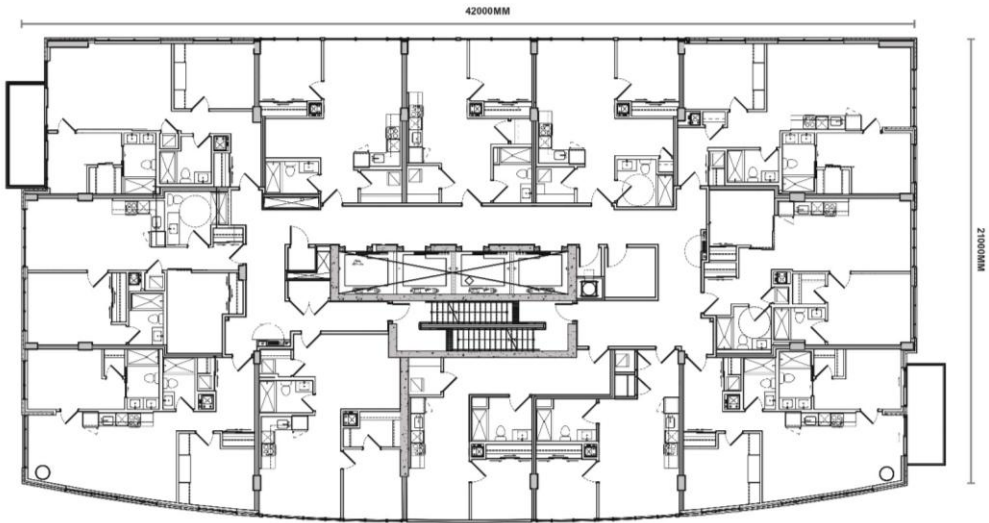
Typical Floor Plans of Towers B1, B2, and B3 (Neuf Architects)
